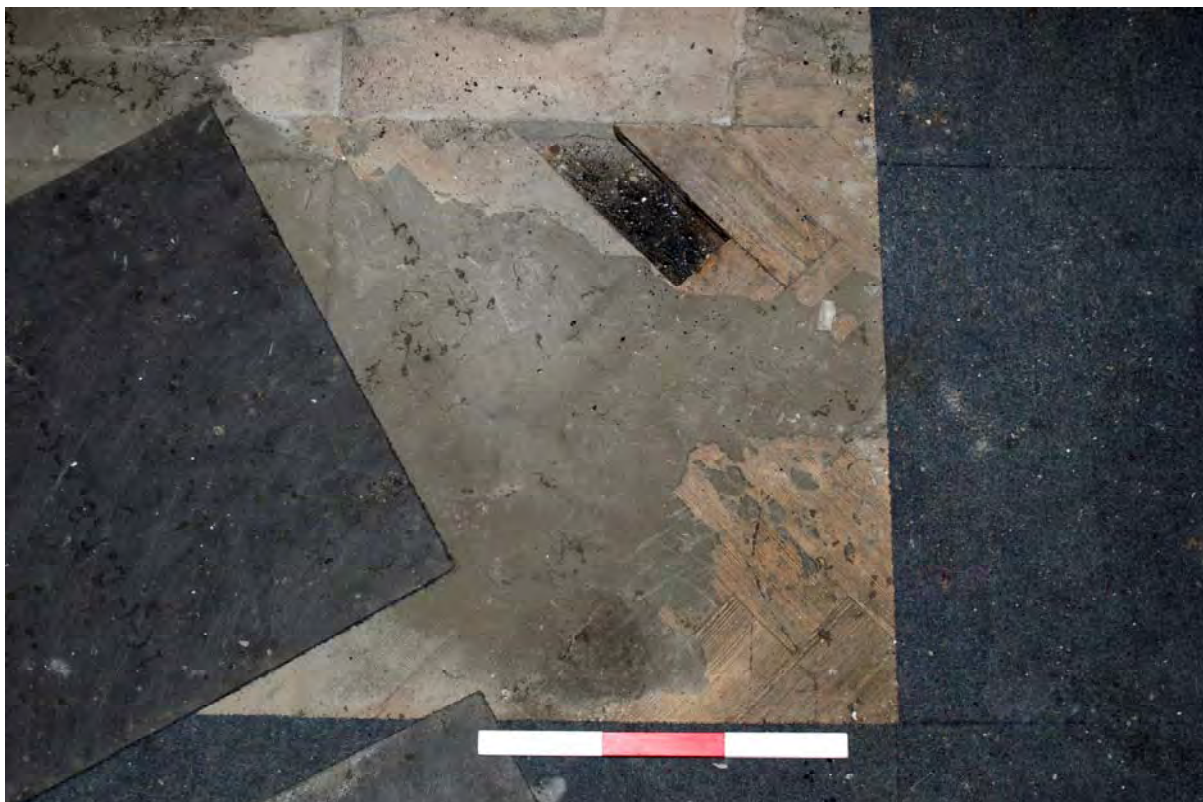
Original flooring under carpet tiles (SJH18-0039)
